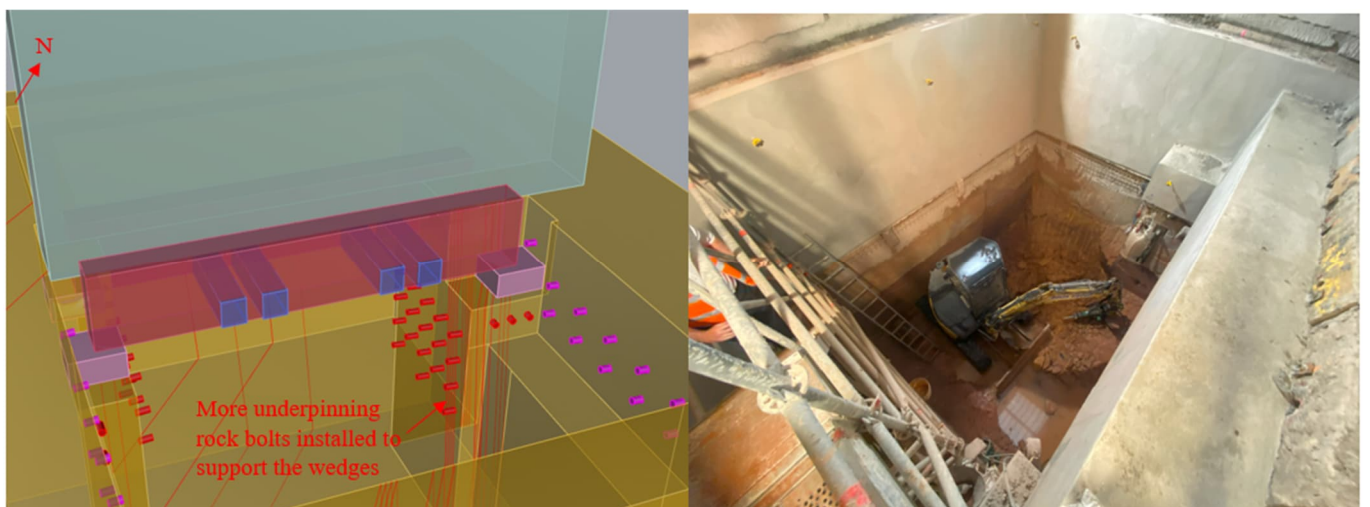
Bulk excavation of the remainder of access shaft - 3D model isometric view (left) and site photography (right)
